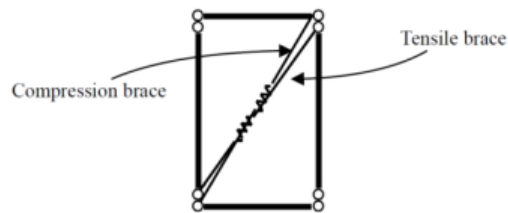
Outline of bracing shear wall (Nakagawa 2011)
